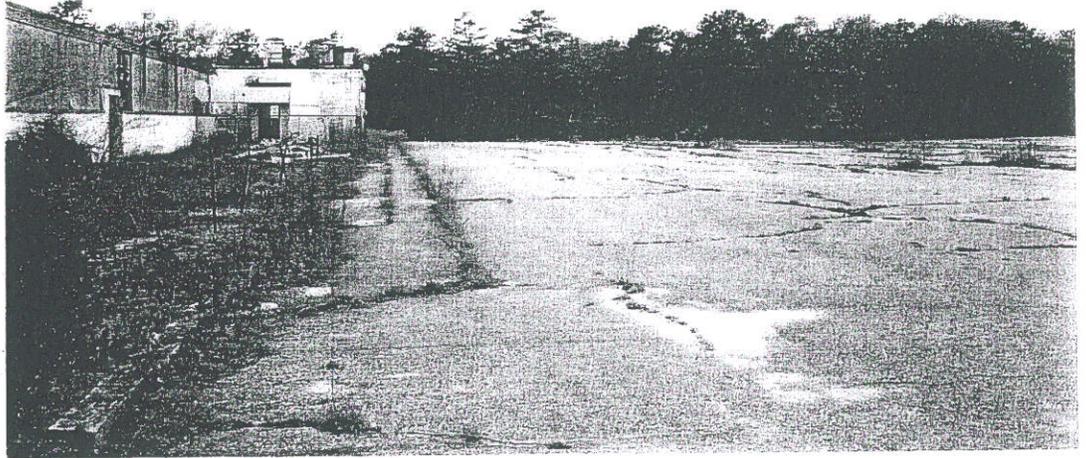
Looking west along rear of Hazeltine building and asphalt parking lot.
